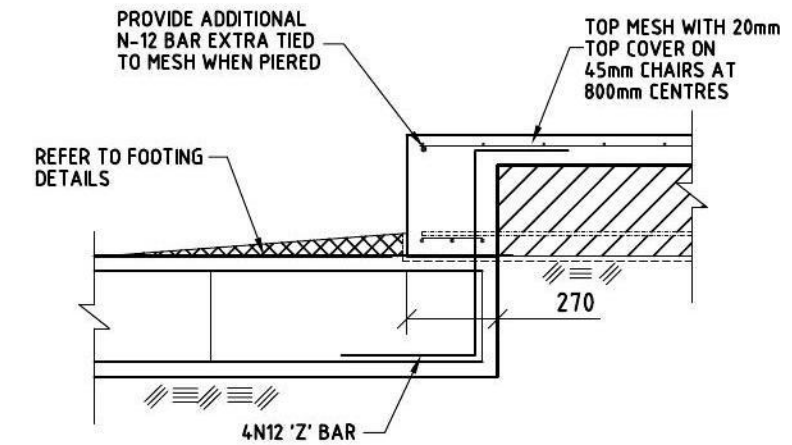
DETAIL - INTERNAL STEP BEAM GREATER THAN 170mm "DST1"
